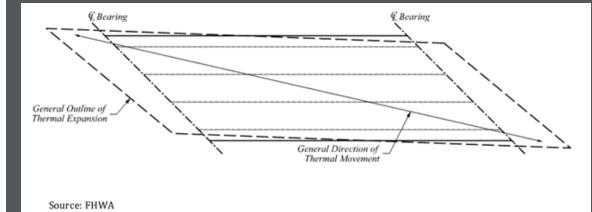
Plan View Showing Typical Thermal Movement on a Single Span Steel Girder Bridge with Parallel Skewed Supports
